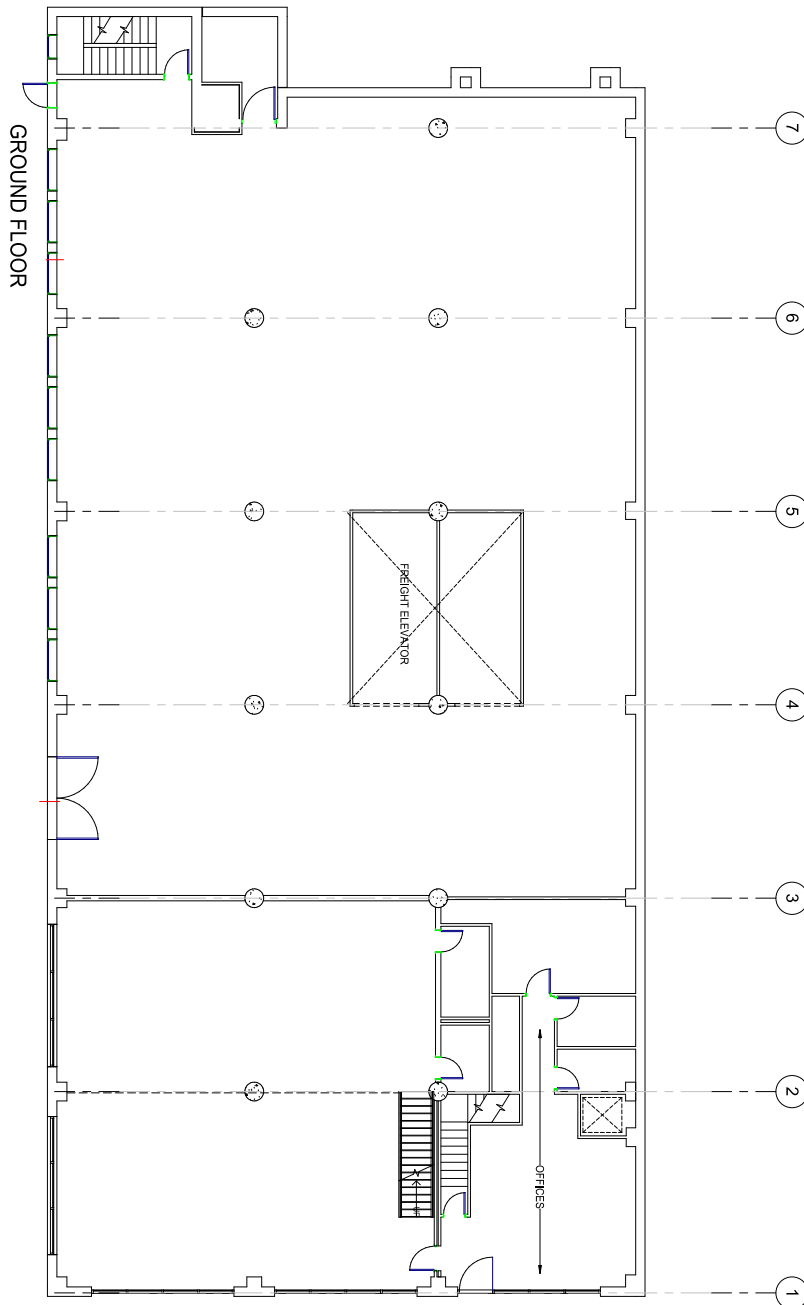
As-Built First Floor Plan. (WILDESIGN Architects, 2018)
